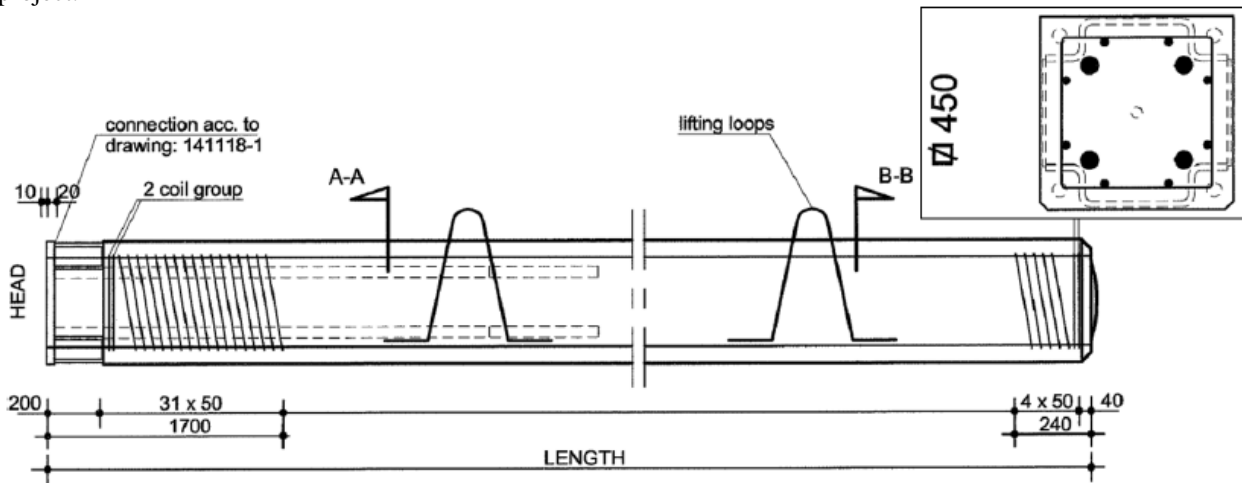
Details on the design of a Pre-Stressed Pre-Cast Concrete Pile to be used for the piling project in Lagos, Nigeria
